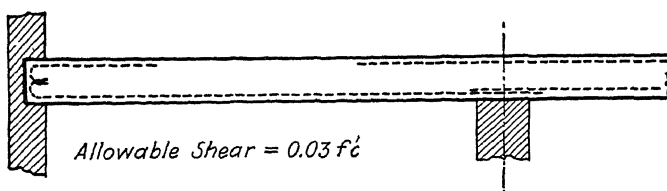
Typical Reinforced Concrete Beam; Special Anchorage of Longitudinal Bars.
